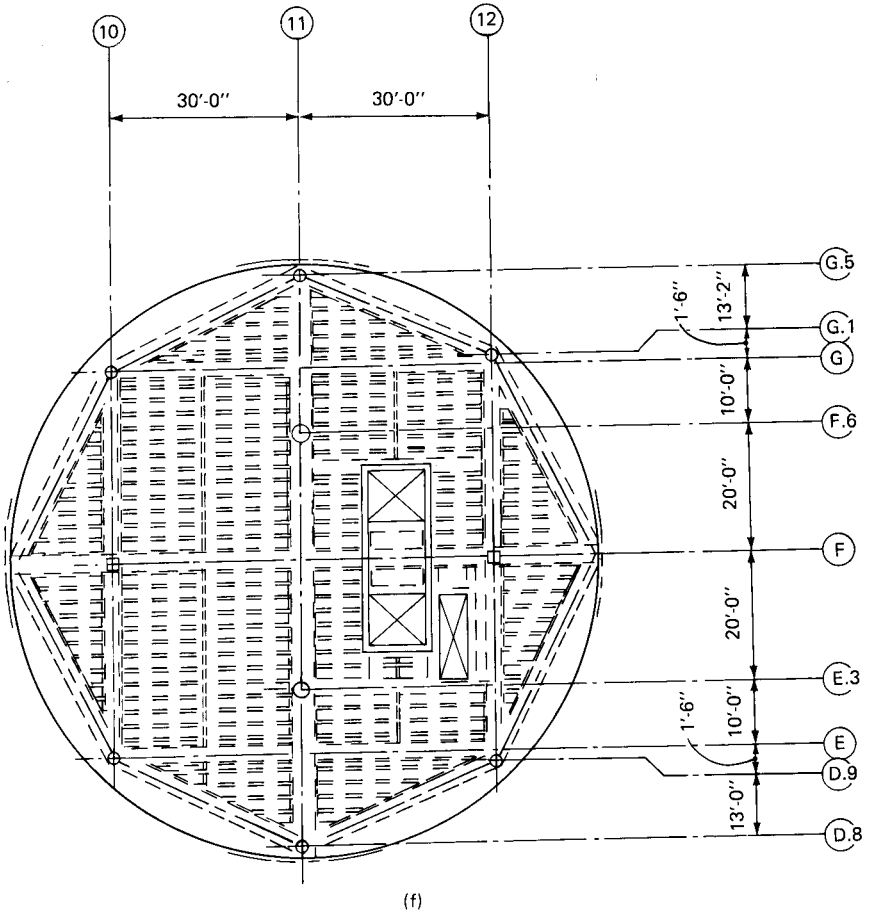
(Continued) (f) levels 50 and 51 floor plan.
